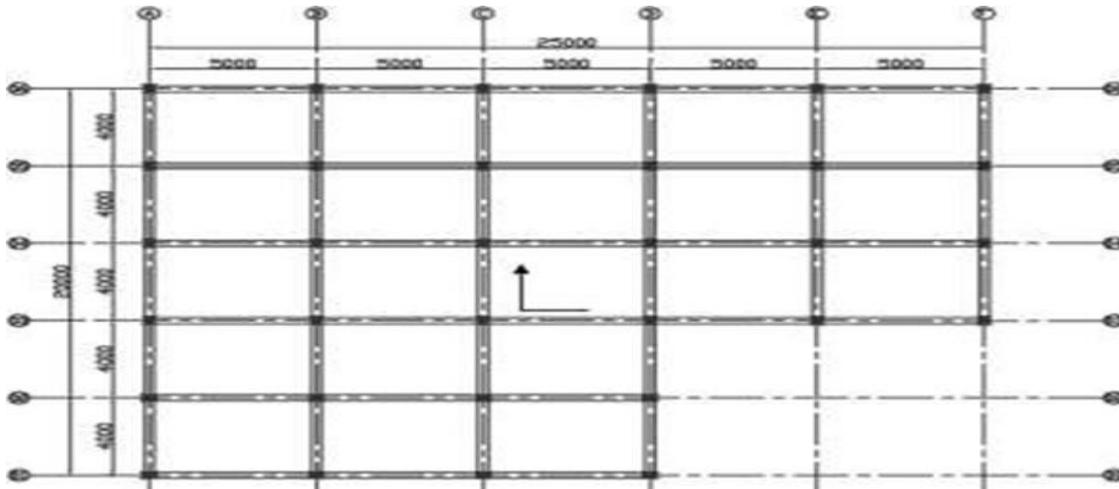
Plan of Two, Six, and Twenty-Story Irregular RC Buildings (All Dimensions Are In Mm)
